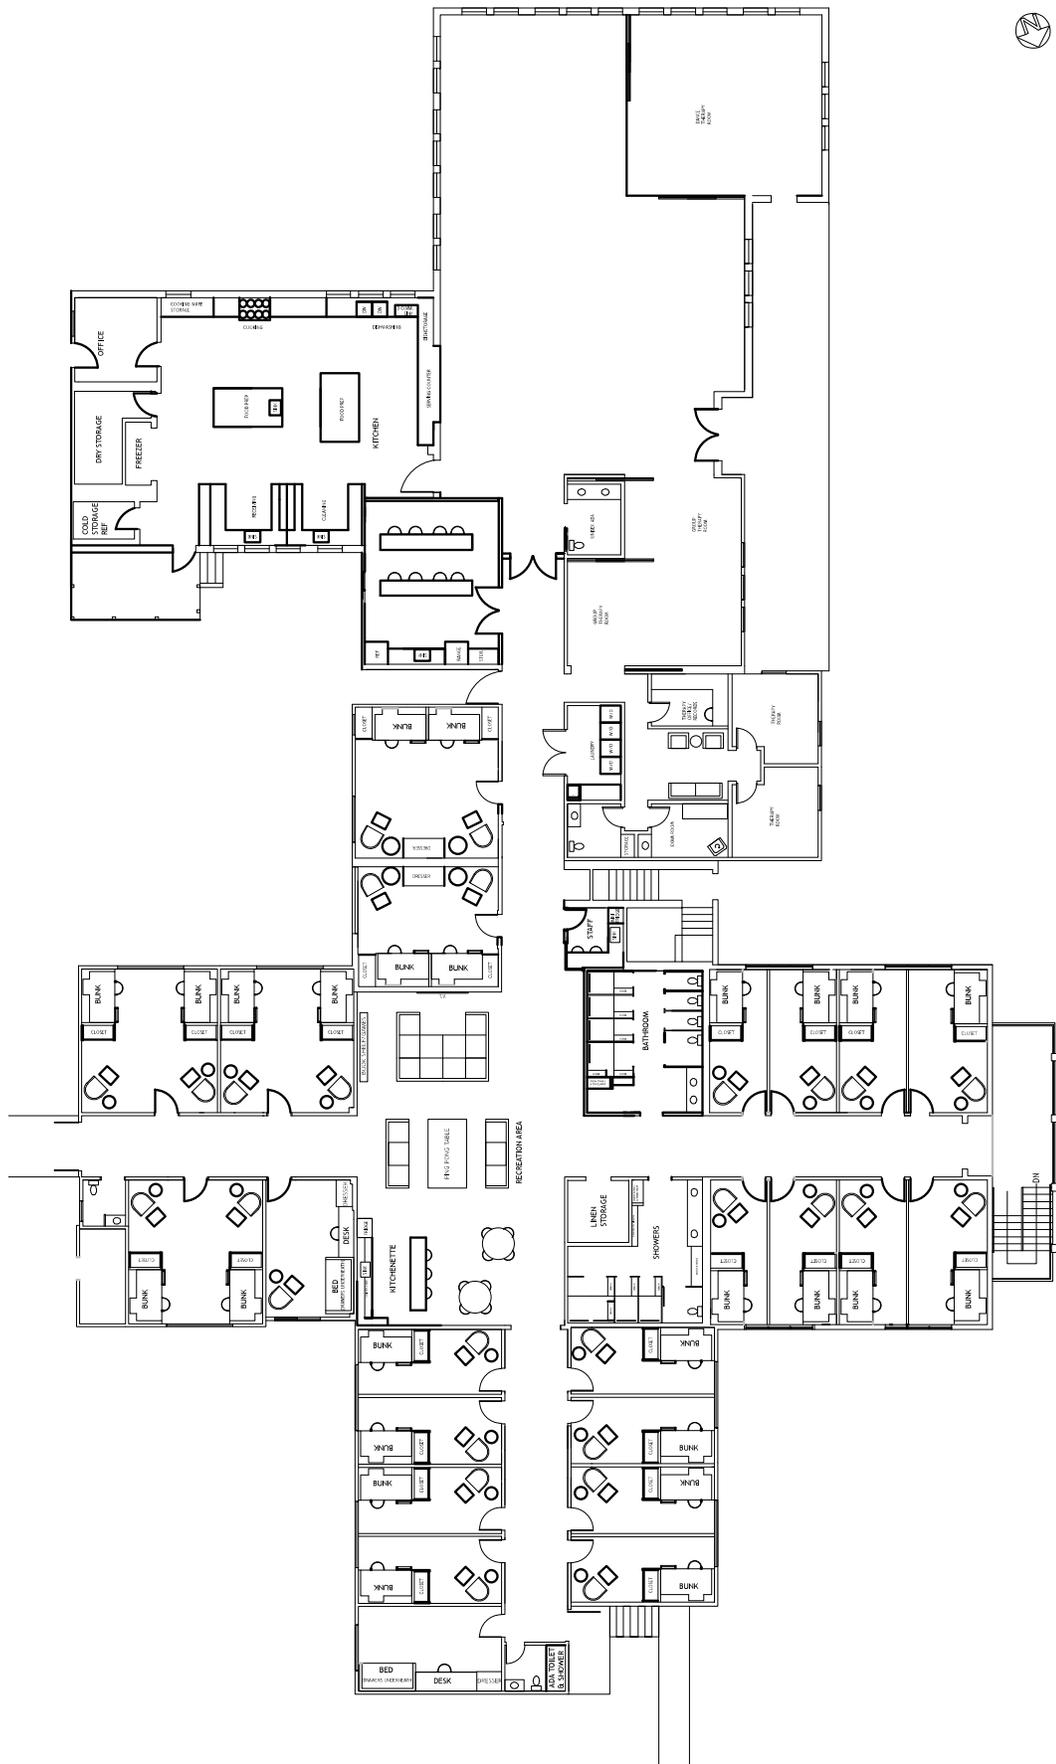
Proposed 2<sup>nd</sup> floor plan.
